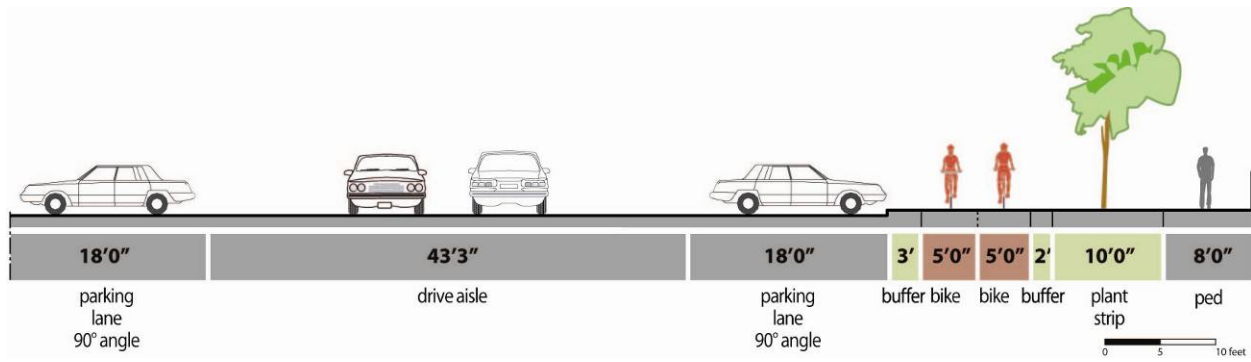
Segment 1E Parking Lot 4 South Proposed Improvements
